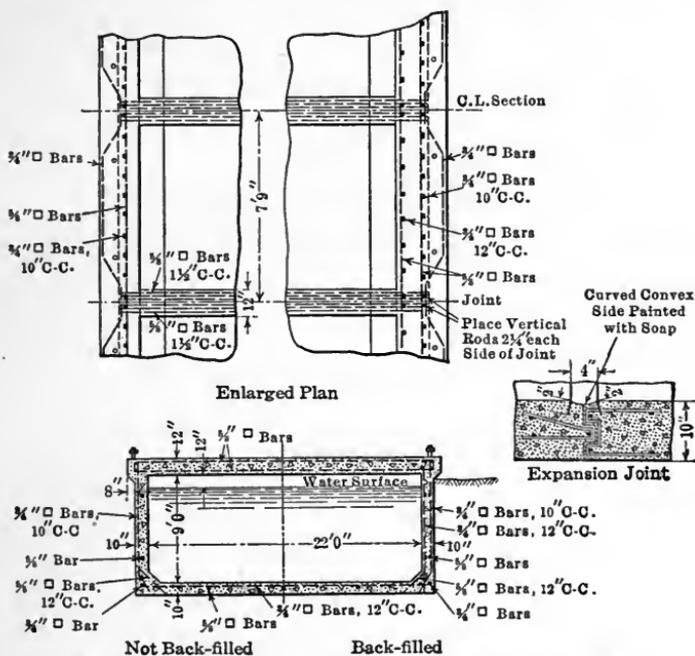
Bench flume of Big Fork Power Plant, Mont.
